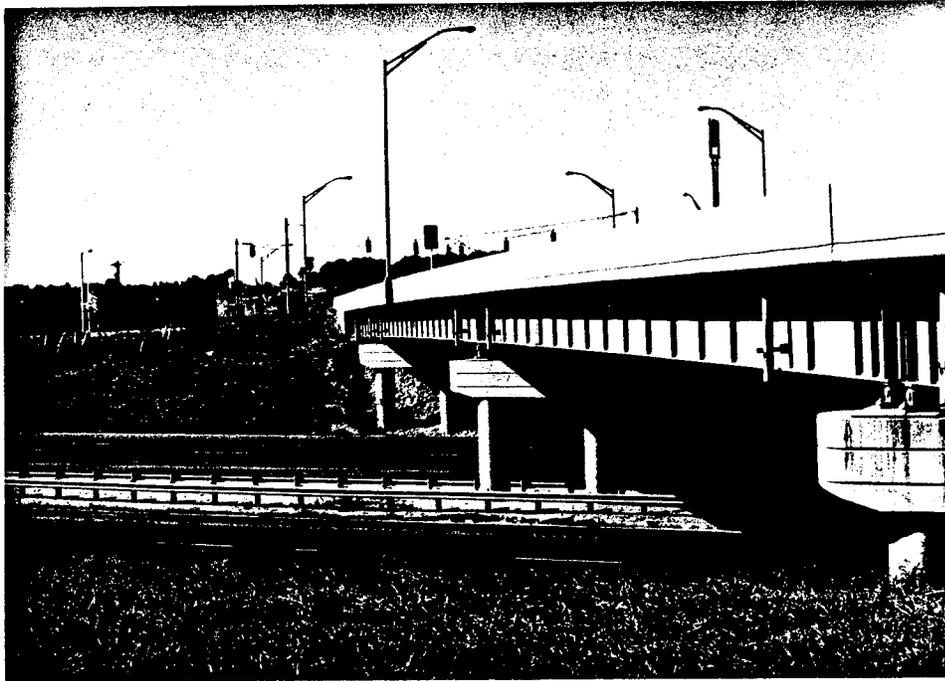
New Painted Girder Bridge, US 62 over I 65 in Hardin County (August 1987).
